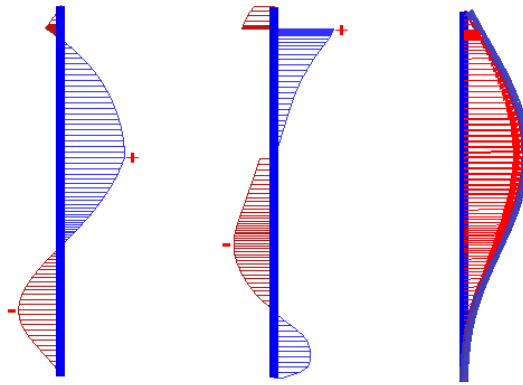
(a) Bending moment in the sheet pile (b) Shear force in the sheet pile (c) Deformation in the sheet pile, for Sitio 1 in the Earthquake load case, where GWT = MSL
